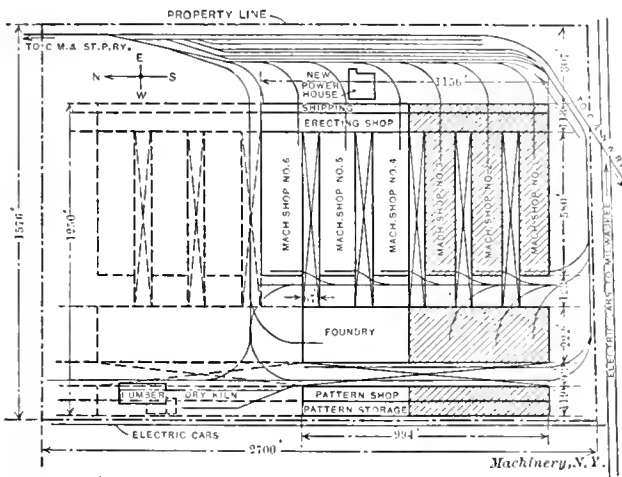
Plan of Allis-Chalmers Co.'s Plant at West Allis, Milwaukee, Wis.
